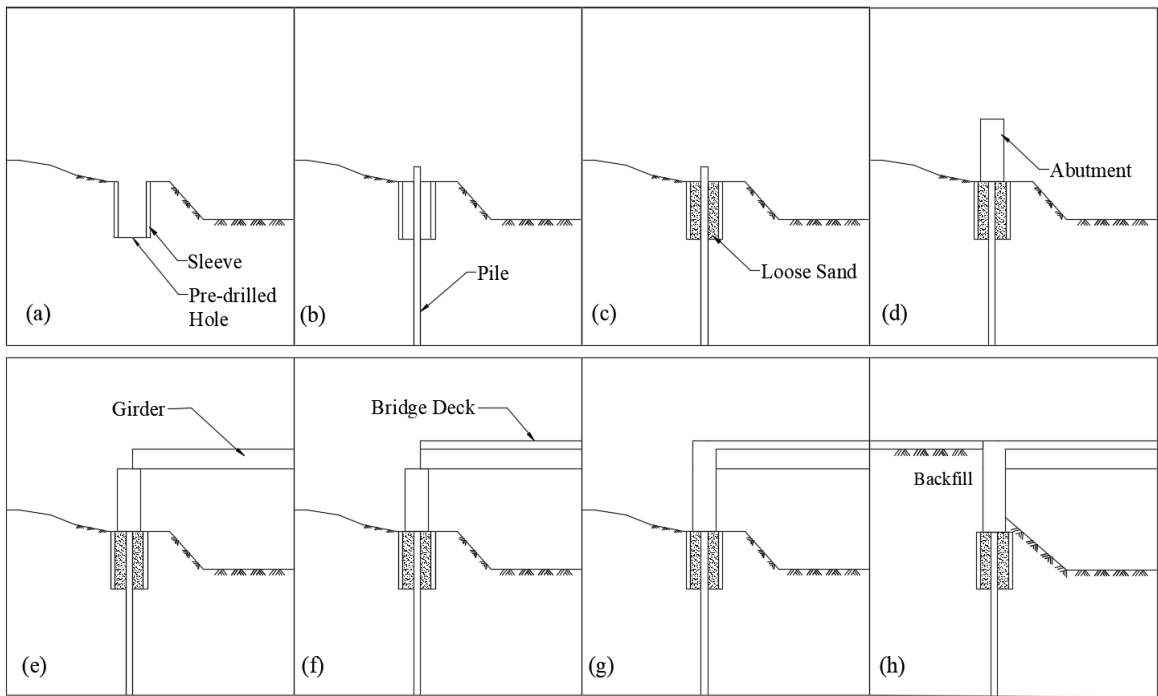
Typical Construction Sequence of Integral Abutment Bridges
